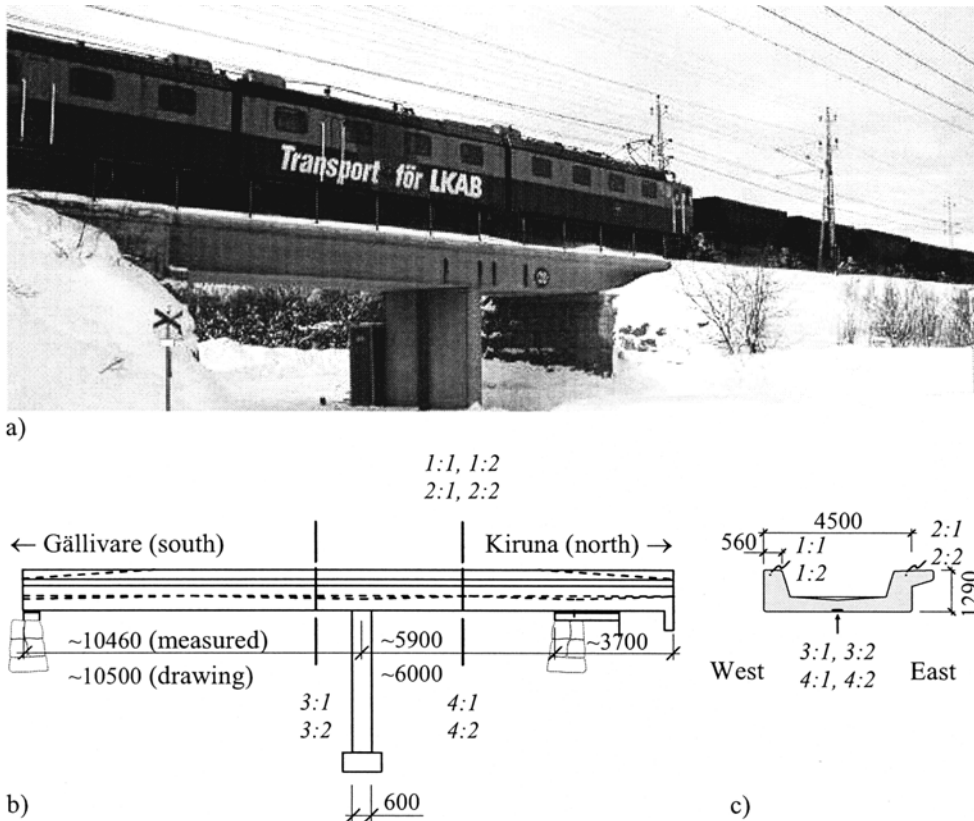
Bridge over Luossajokk in Kiruna in northern Sweden; a) Older type of iron ore train (DM3 25 tons) heading south towards Gällivare, b) elevation and c) cross section with location of strain gauges.
